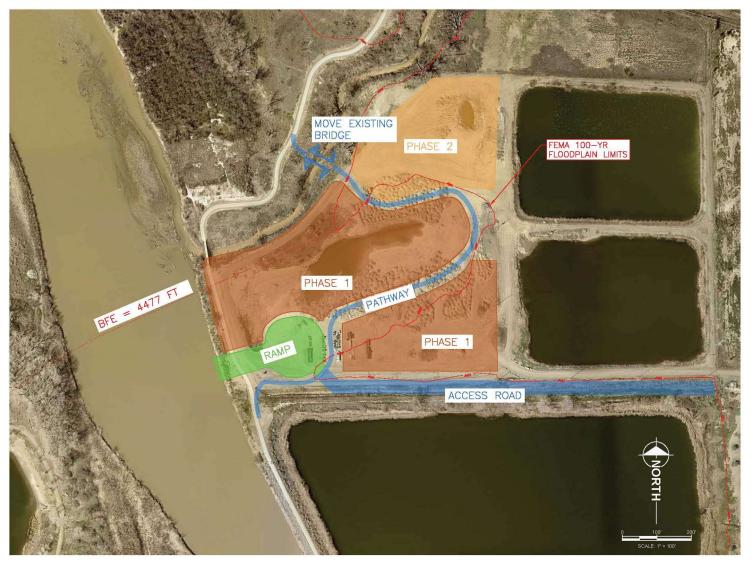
Conceptual Site Layout (provided by 2 Forks)
